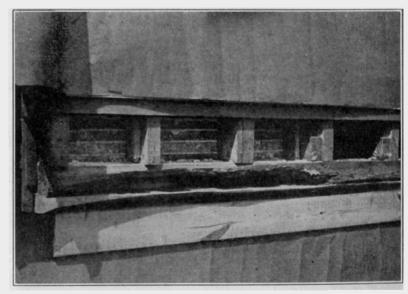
Termite damage to sill and studding of house. The entry was through hollows in the concrete block foundation (covered by building paper).
